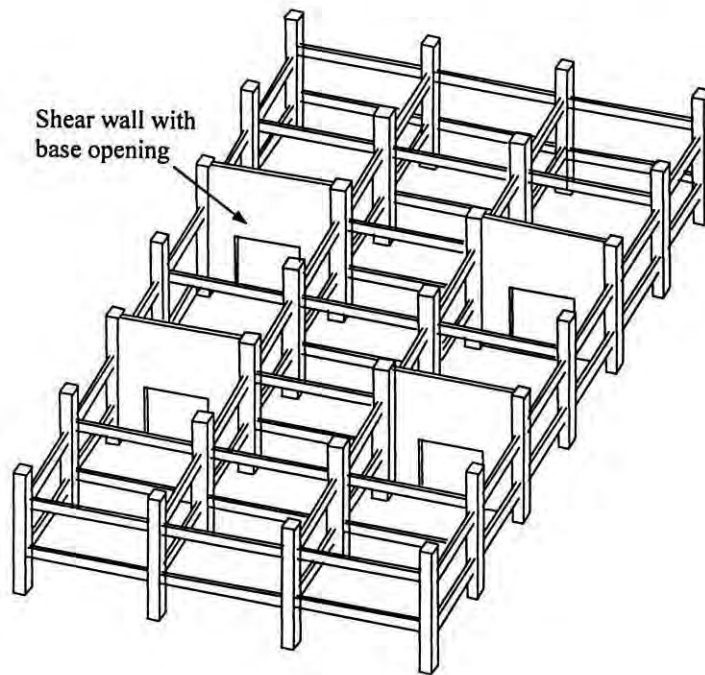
Partial View of the Type-3 (Frame + Shear Wall + Base Opening).
